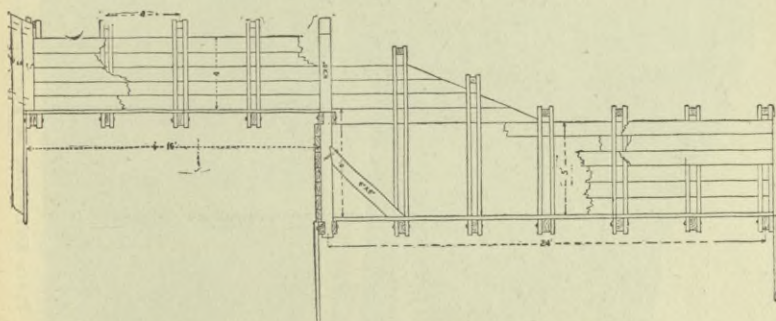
LONGITUDINAL SECTION OF FALL, ARIZONA CANAL.
